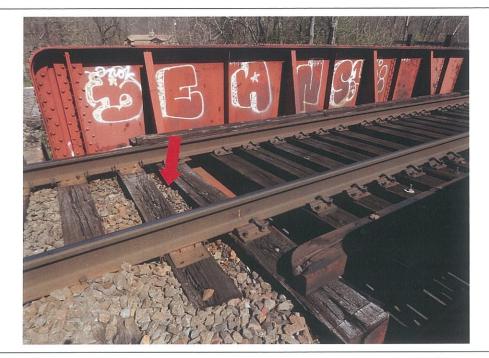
Decayed ties at the west approach on Track #1, looking northeast. Note low ballast adjacent to the bridge (Arrow) and graffiti at the web plate of Girder G4.
